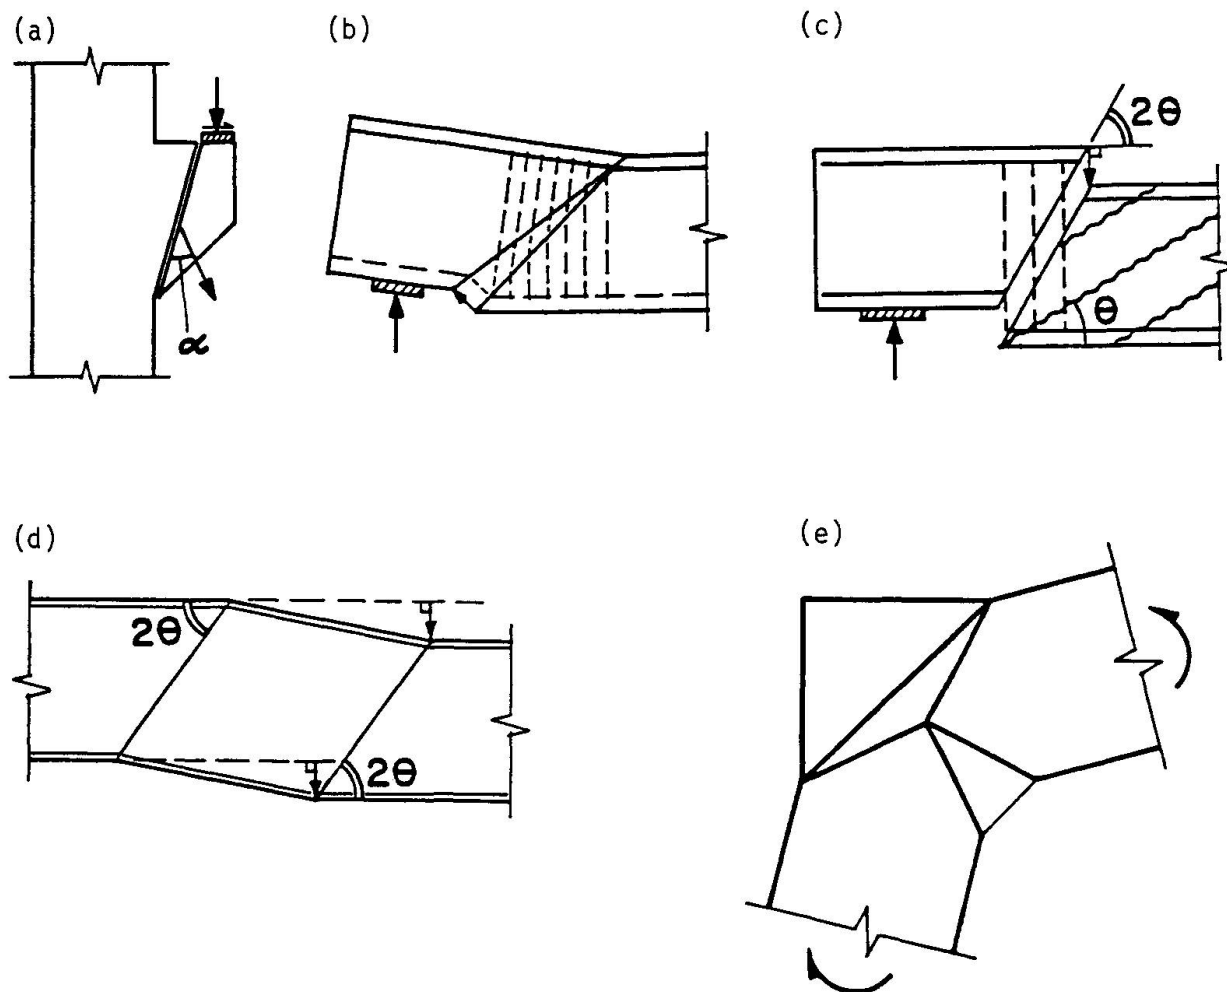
Failure mechanisms: (a) Discontinuity surface in corbel; (b) Collapse crack in beam; (c) Web crushing mechanism; (d) Web crushing and stirrup yielding in zone of homogeneous deformation; (e) Collapse crack mechanism for knee joint subjected to opening moment [41].
